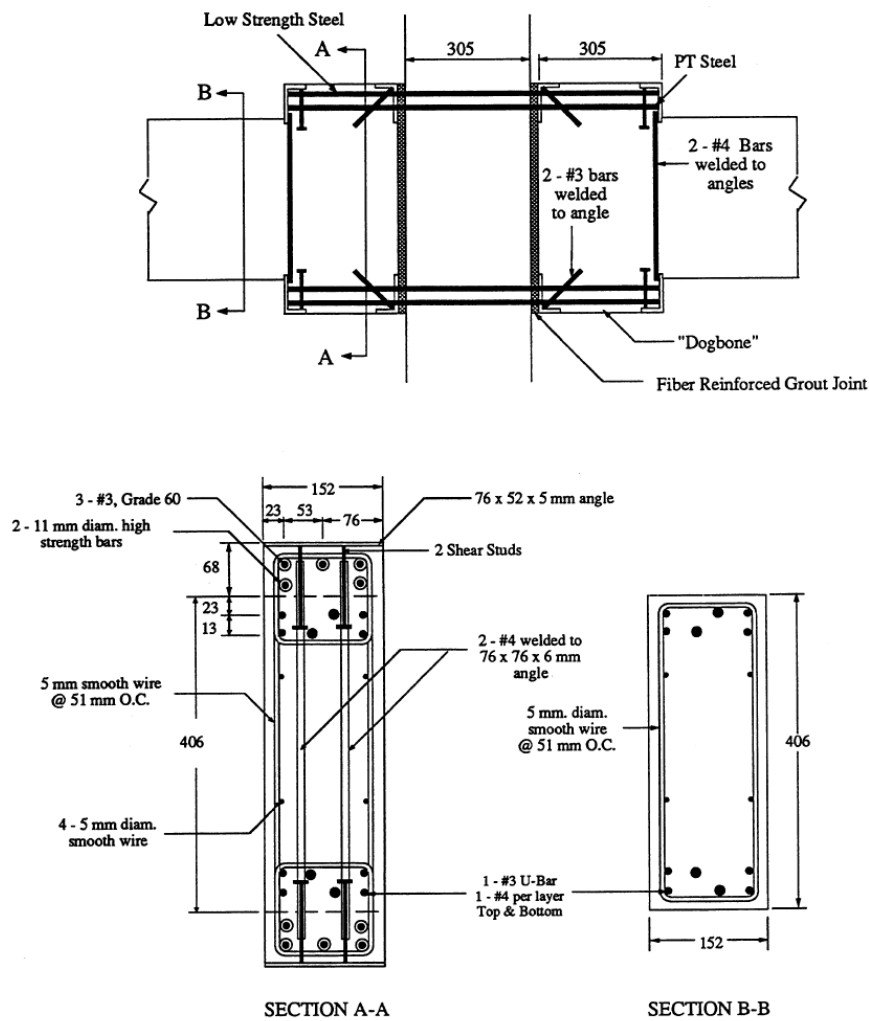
Details of specimen J-P-Z4 (Cheok et al., 1993).
